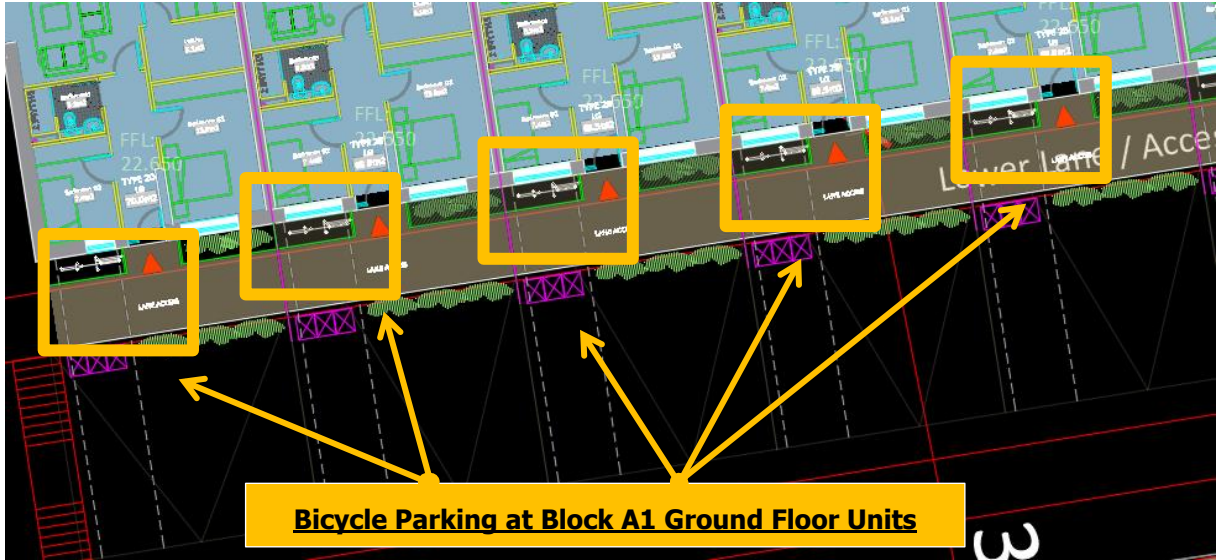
Cycle Parking at Block A1 (Lower Ground Floor Units)
